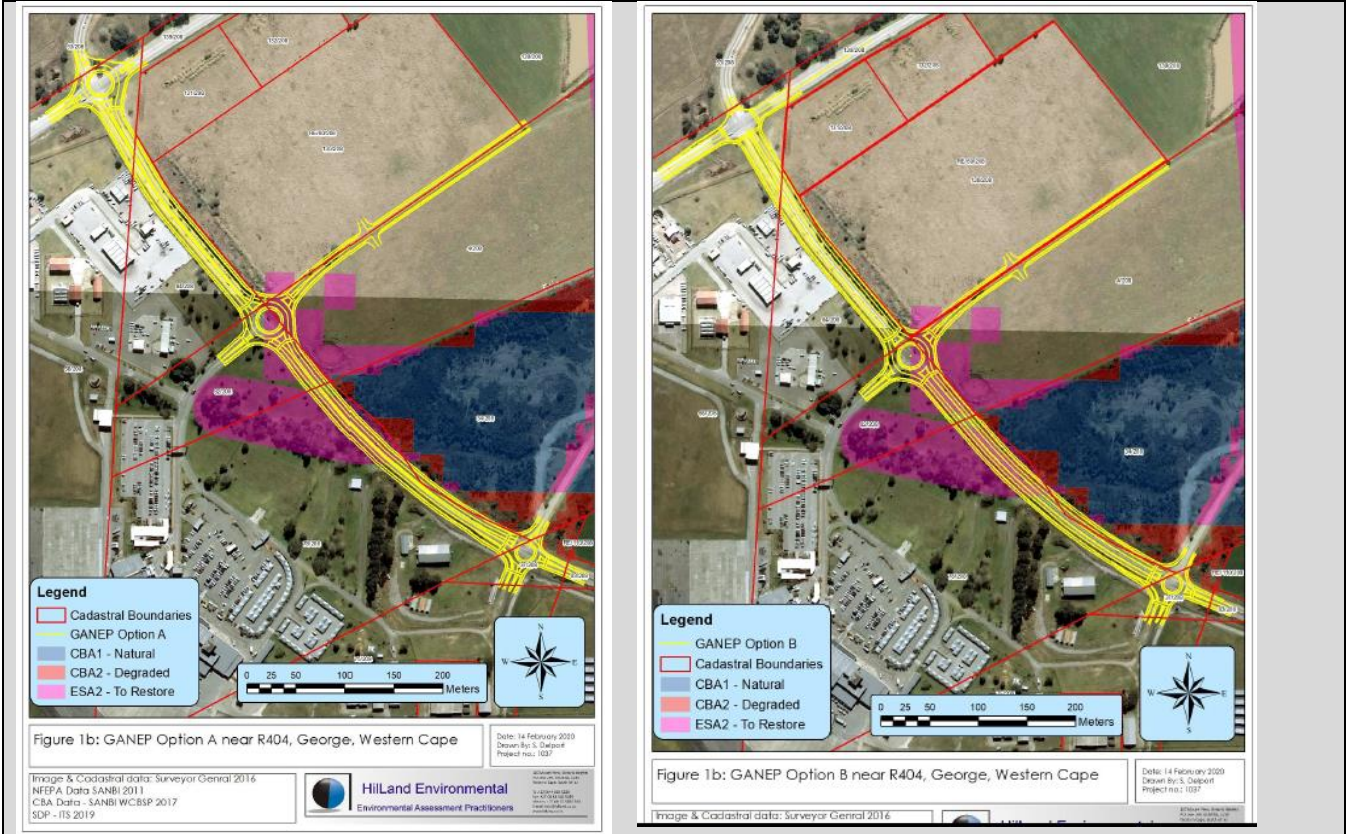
Approved Roads Master Plan Layouts 4 May 2021
